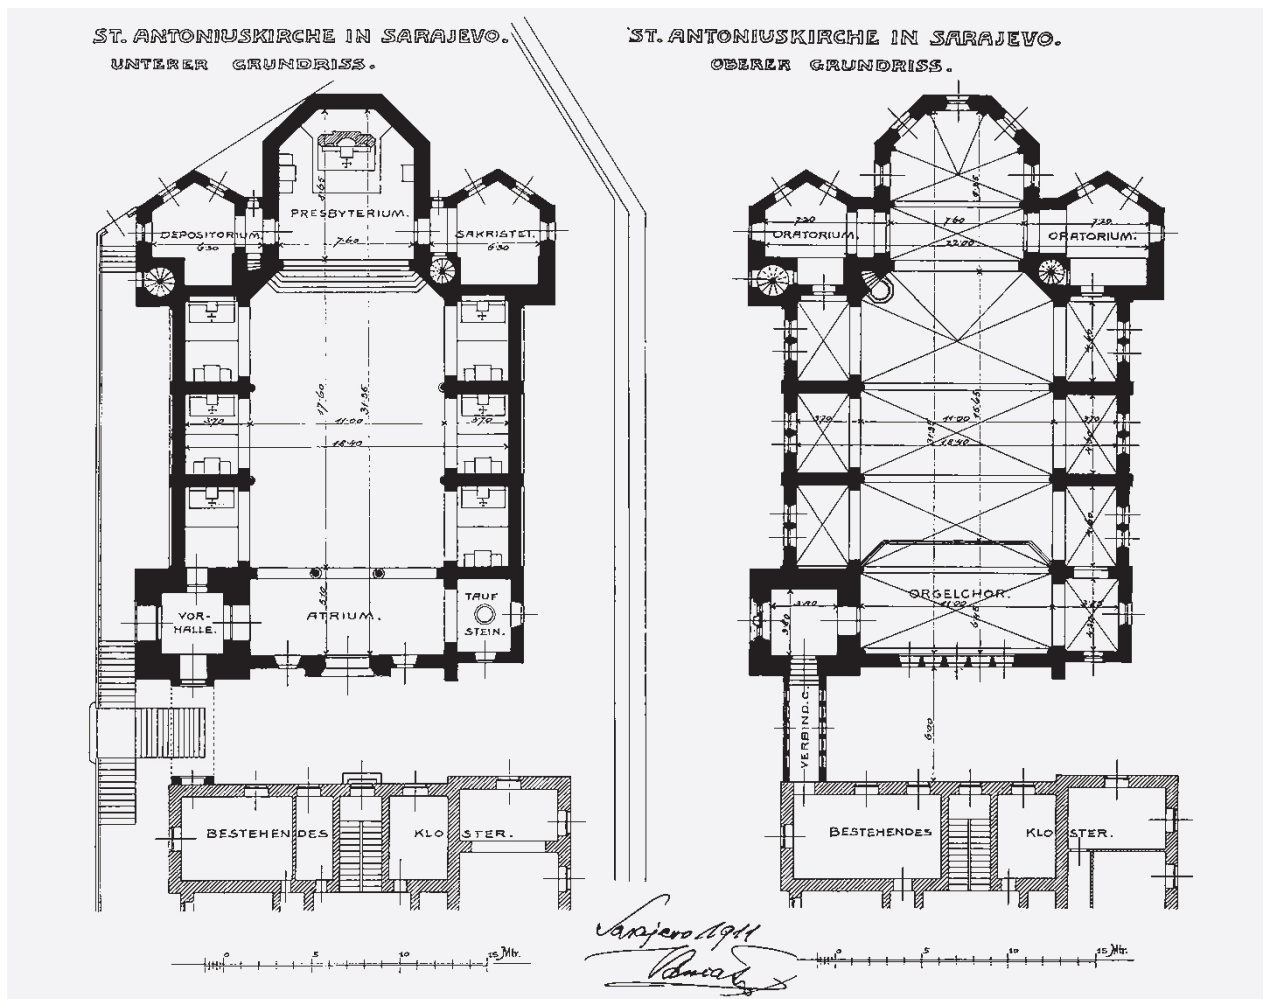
The convent church of Saint Anthony of Padua, Bistrik: ground and first floor plan, segment of the second project, with apse on the east and access bridge on the north, done by Josip Vancaš (Damjanović 2014, 106)
